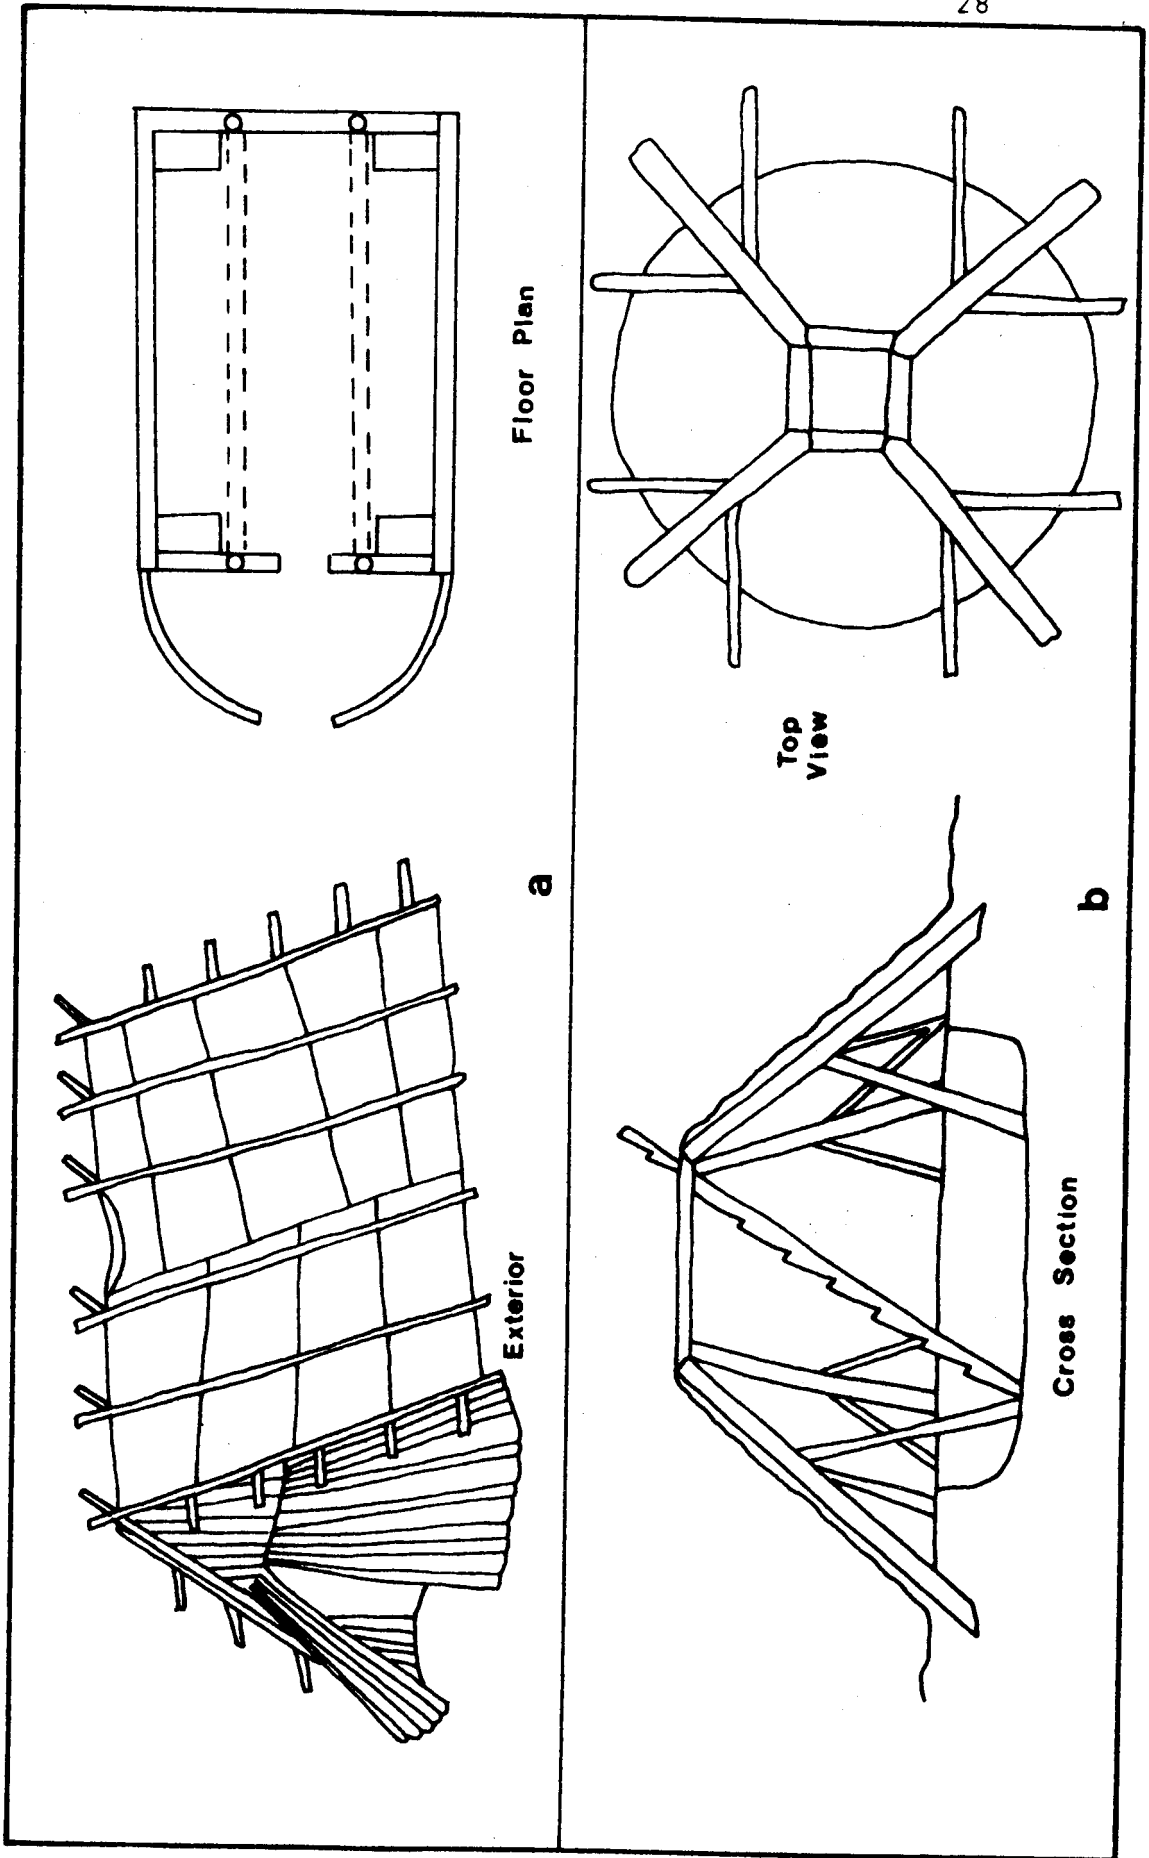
Carrier winter dwellings (after Morice 1893): a. winter house, b. semi-subterranean 'pit house'.
